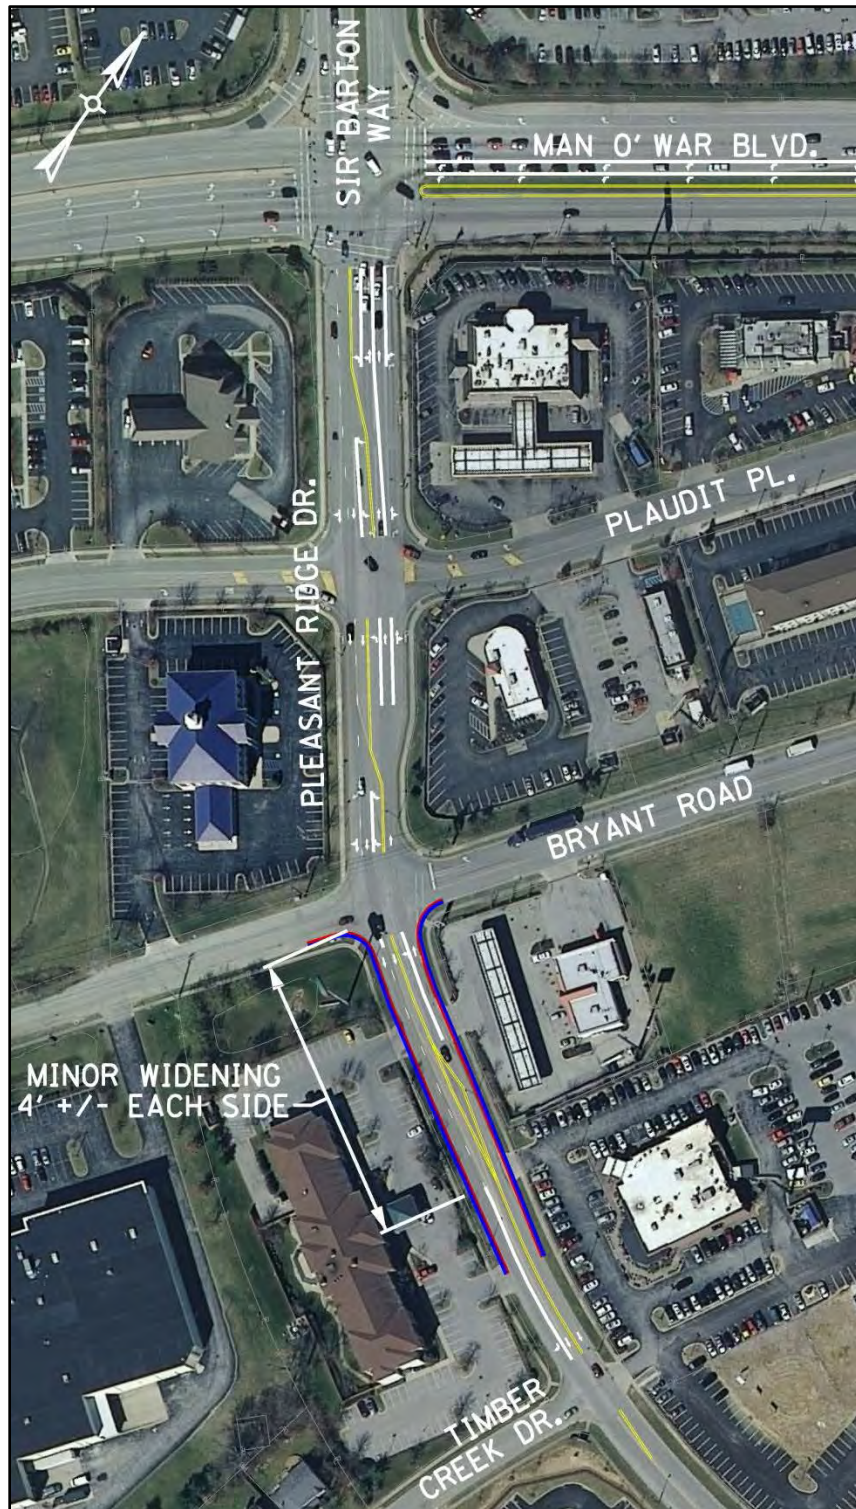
Restriping and Widening on Pleasant Ridge Drive
